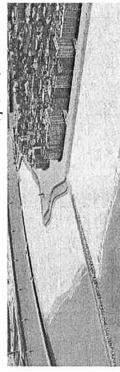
Artist impression of variant 1: SWB around the existing dike
